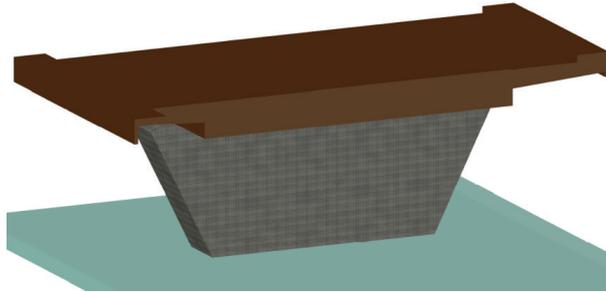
Pillar riverine with the front inclined towards the foundation (*by MJ*)
